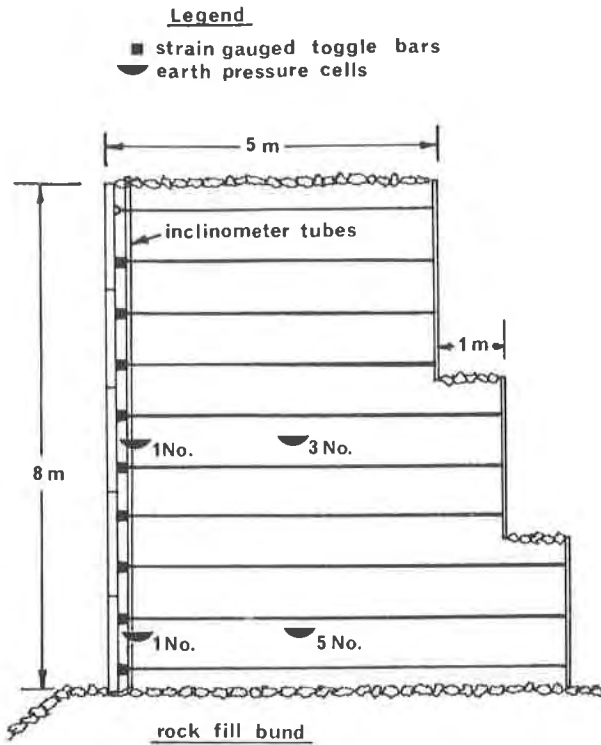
Schematic of cross-section of Jersey wall showing instrument positions.
